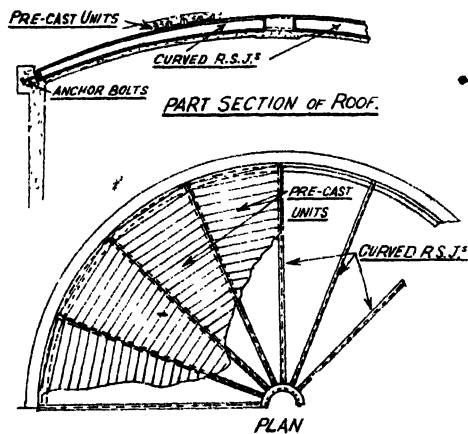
TYPICAL DOME ROOF CONSTRUCTION
